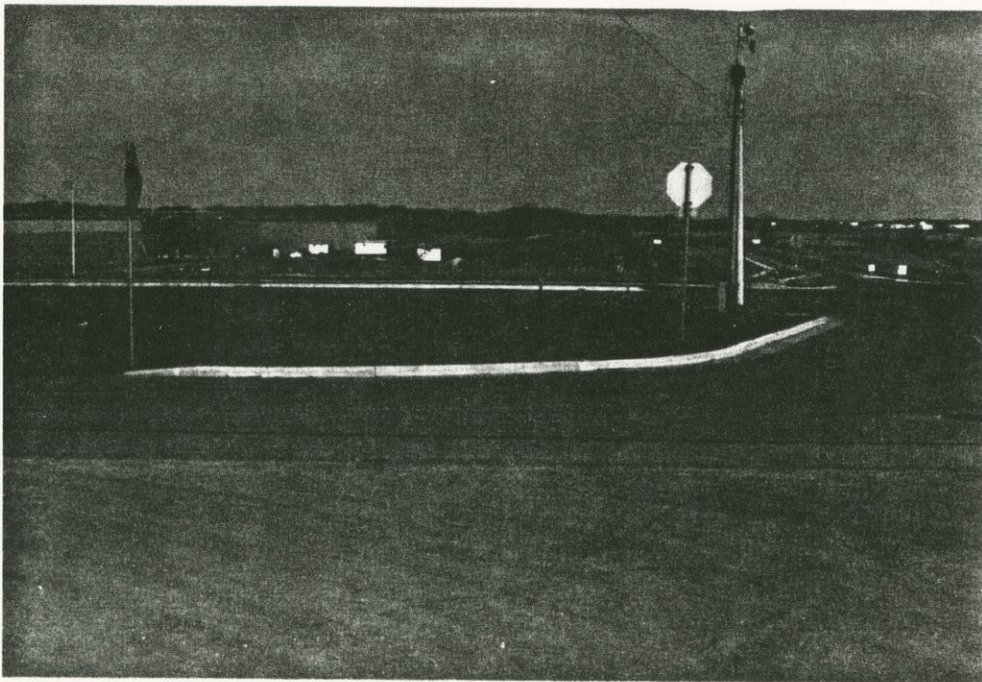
Looking east along Royal Avenue from existing Raywood Road intersection.
